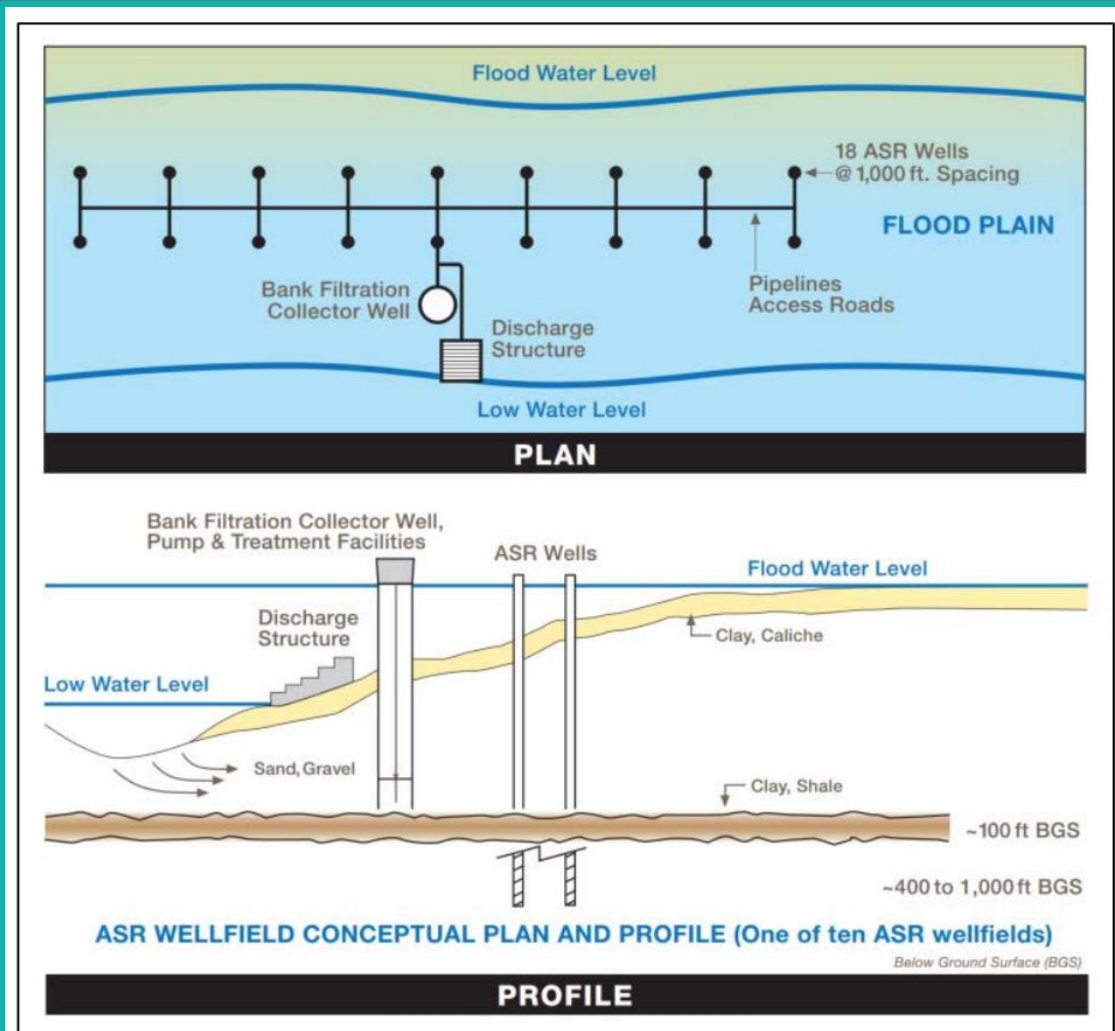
ASR Wellfield Conceptual Plan and Profile
